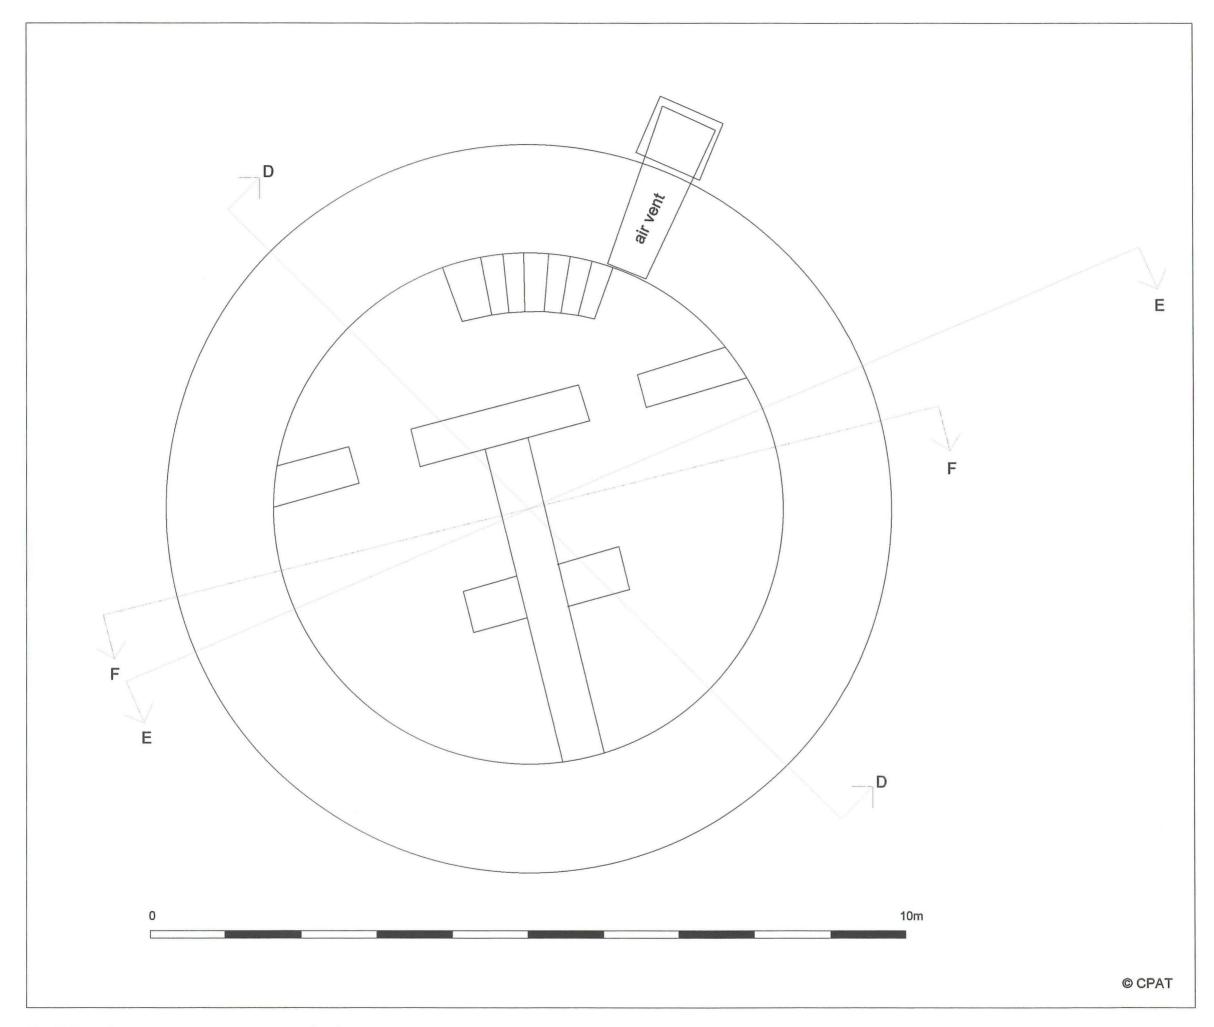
Roundhouse Farm south-west tower, cellar plan
